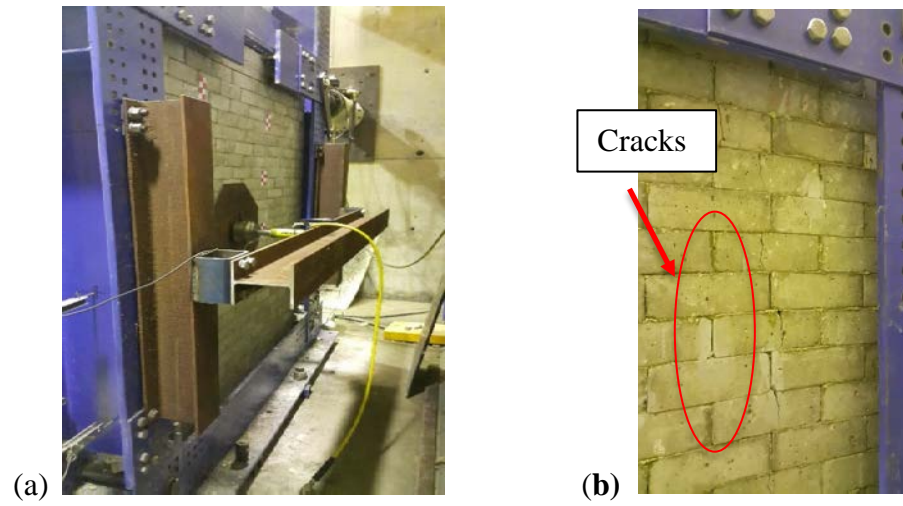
Hydraulic jack setup (a), cracks after previous in-plane test (b)
